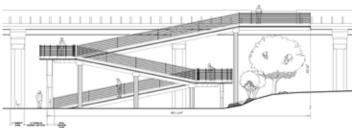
Conceptual Drawings for the Turkey Creek Trail Connection at 7th Street Images: Turkey Creek Corridor Enhancement Plan
